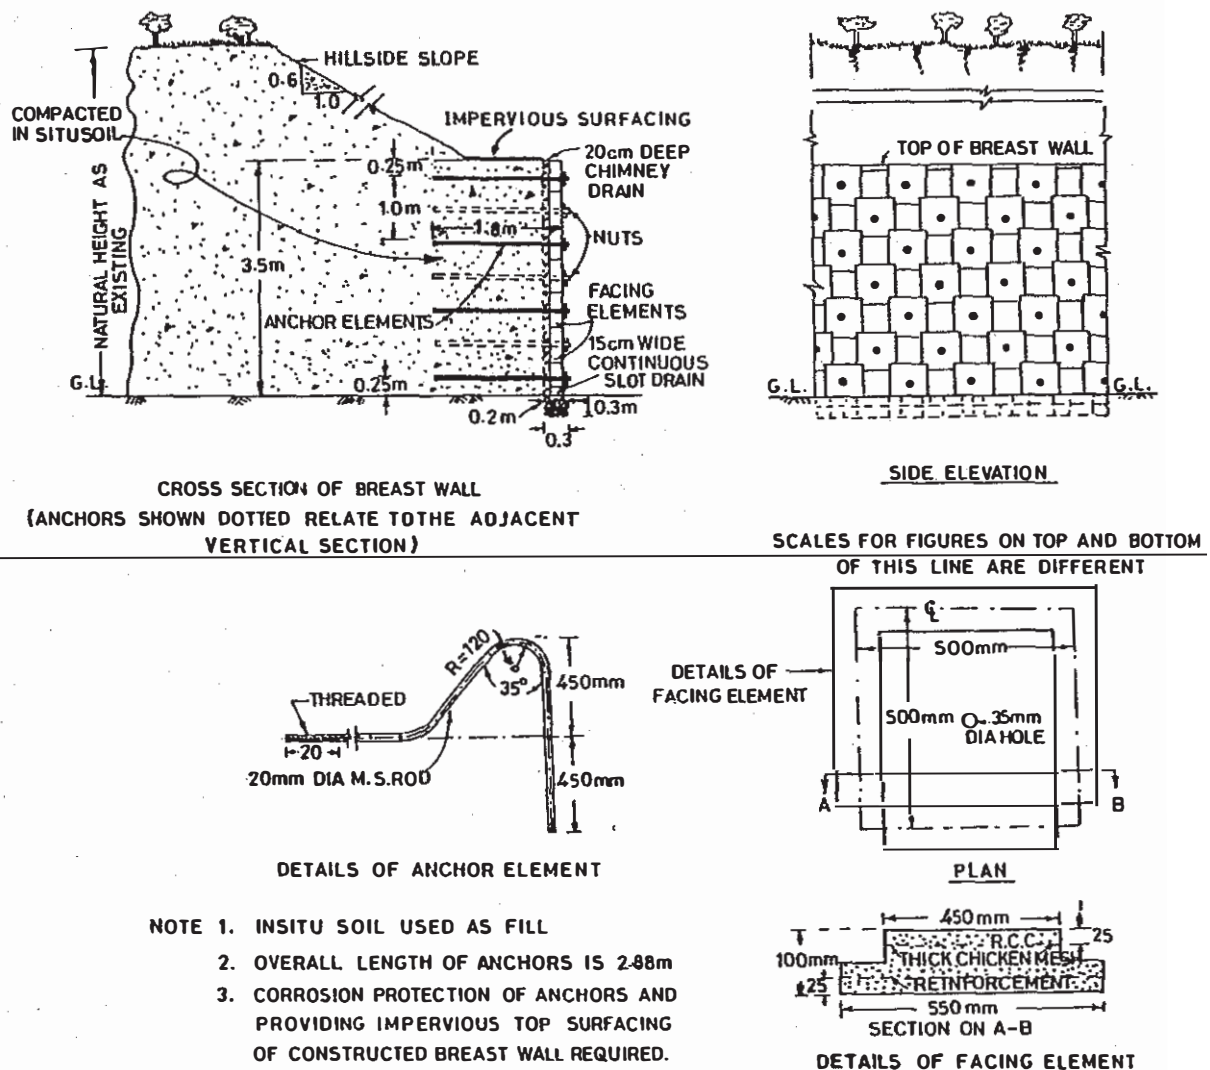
Details of Anchored earth breast wall for a site in the sub-Himalayan region.
